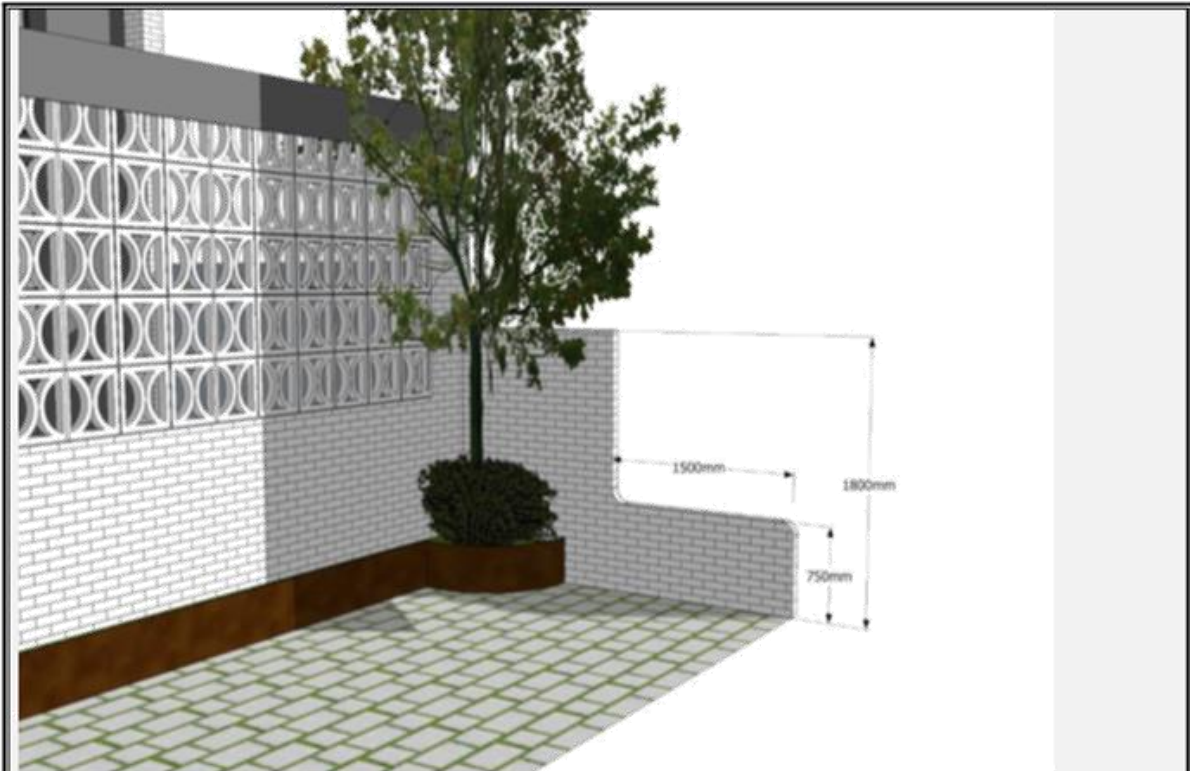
Source: Attachment 2 – Amended Development Plans showing northern acoustic wall
